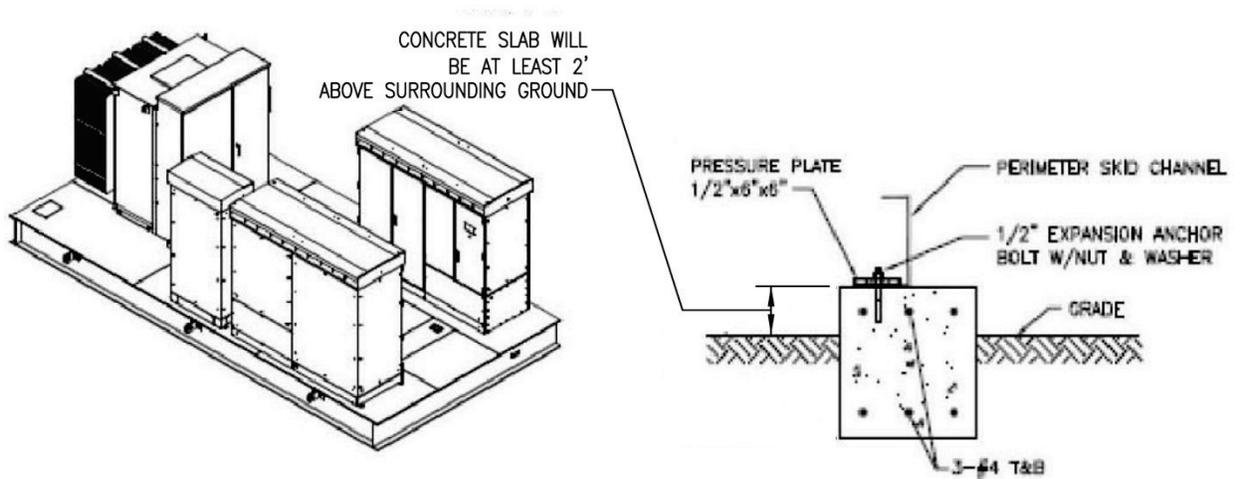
EQUIPMENT PAD CONTAINING INVERTER AND TRANSFORMER
